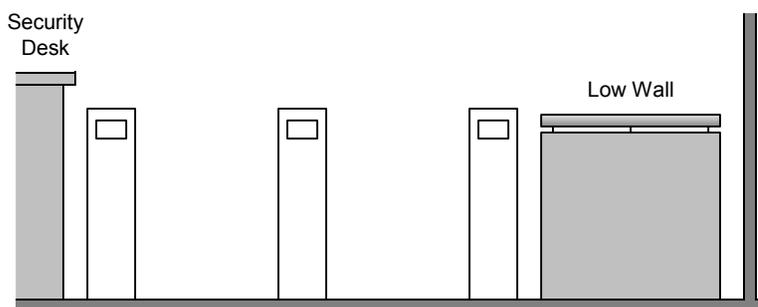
Typical installation between security desk and wall, with low barrier wall to fill in extra space
